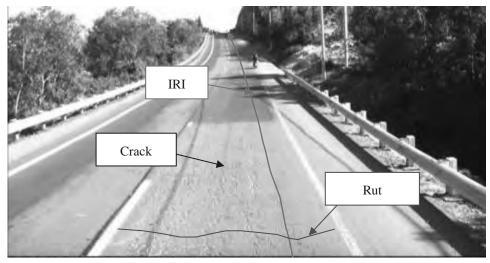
Pavement damage to be evaluated by PCS
